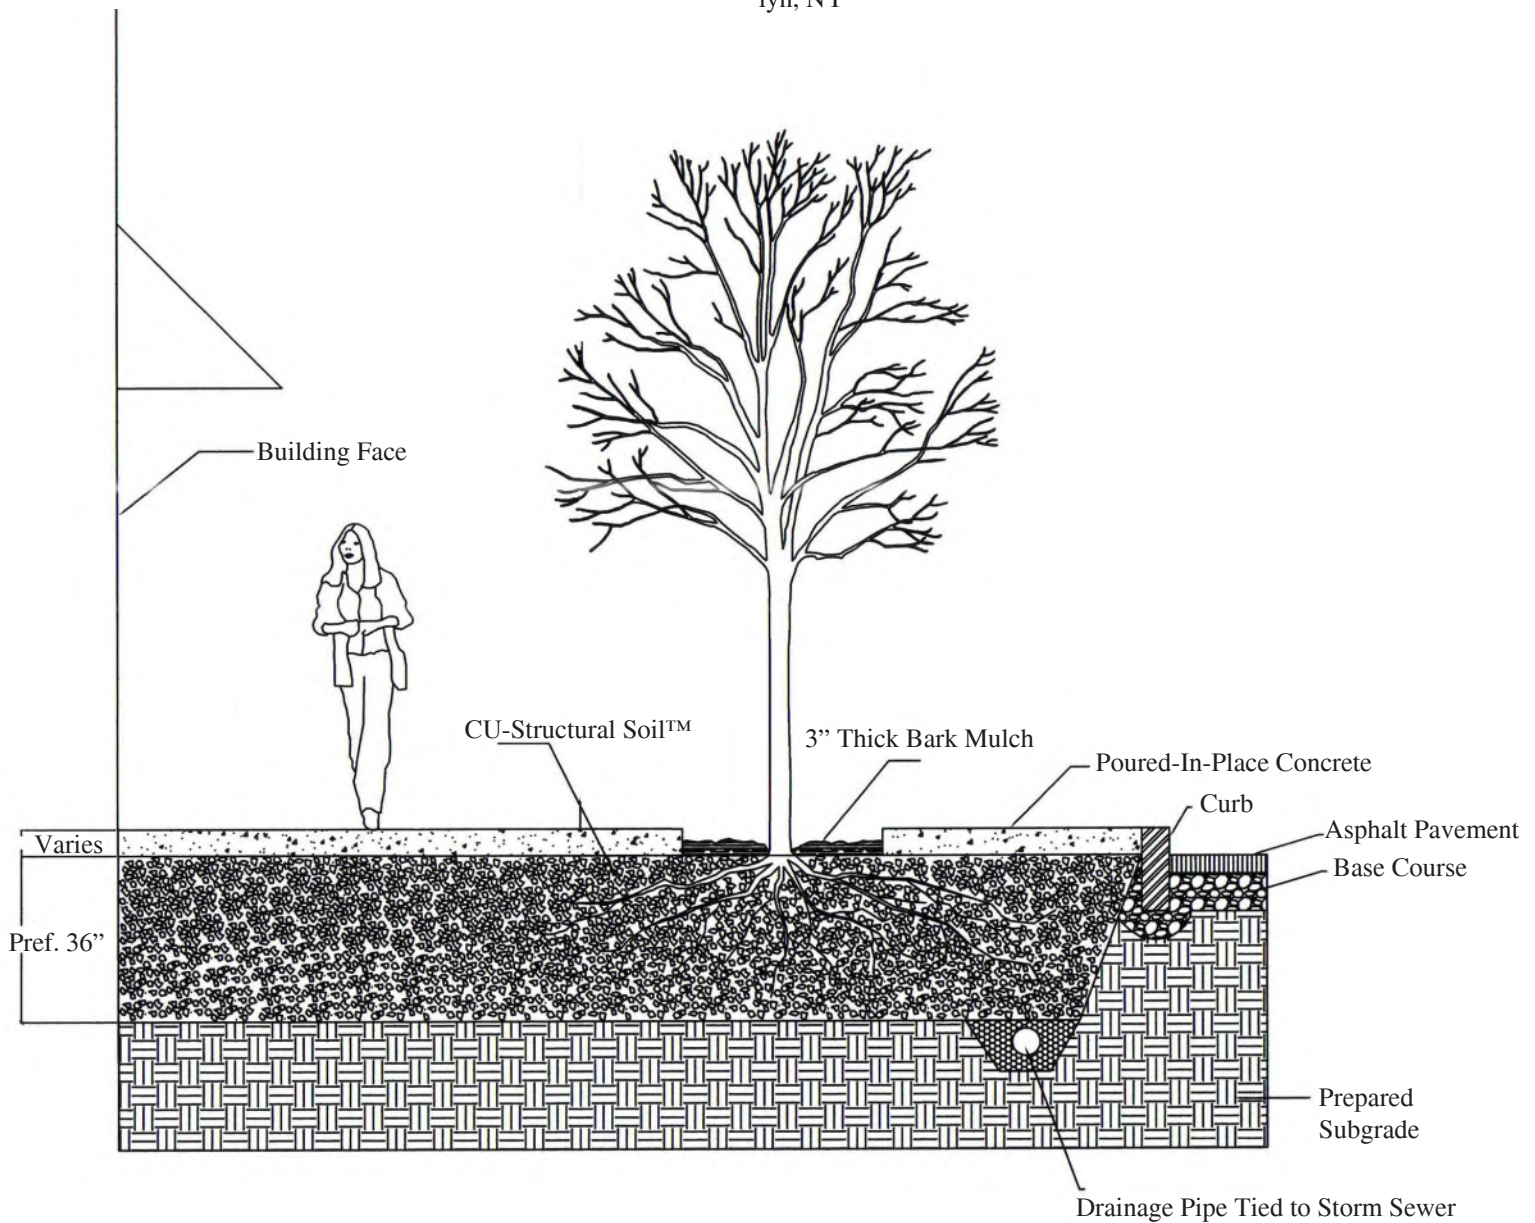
Typical street tree planting using CU-Structural Soil™ under a sidewalk
